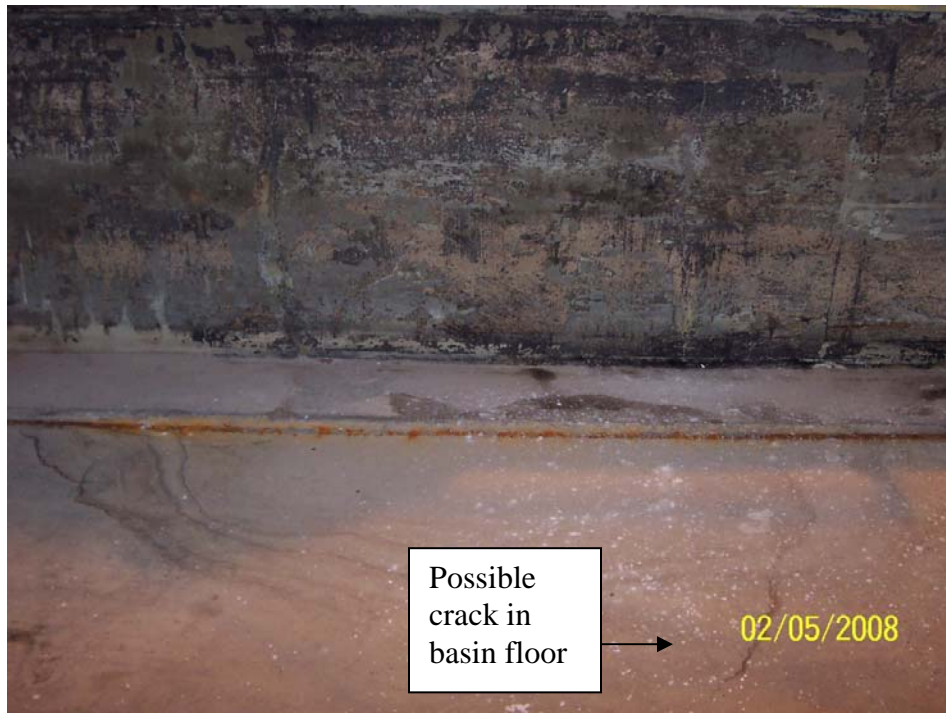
Building 41, South Settling Basin looking at southern wall, and possible crack in basin floor.
